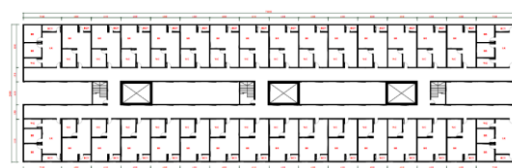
Typical floor plan of Rusunami apartment used for analysis.
